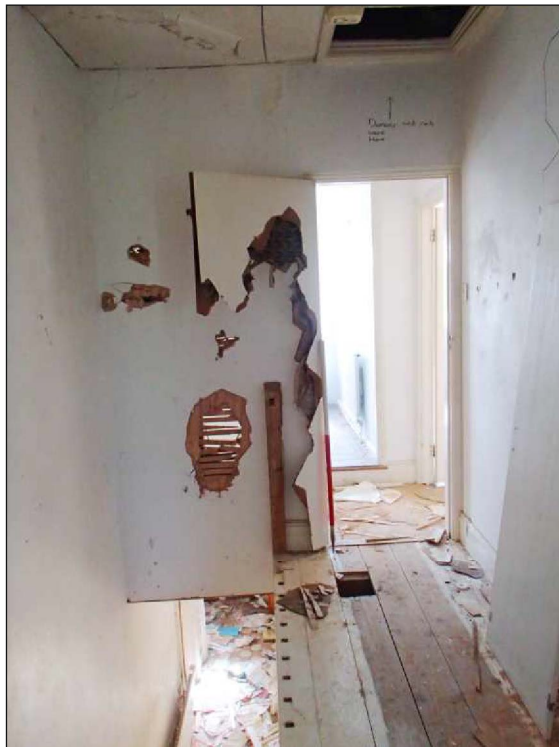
First floor landing, showing lath and plaster partition wall and location of removed railings, looking east-southeast. (1m scale)
